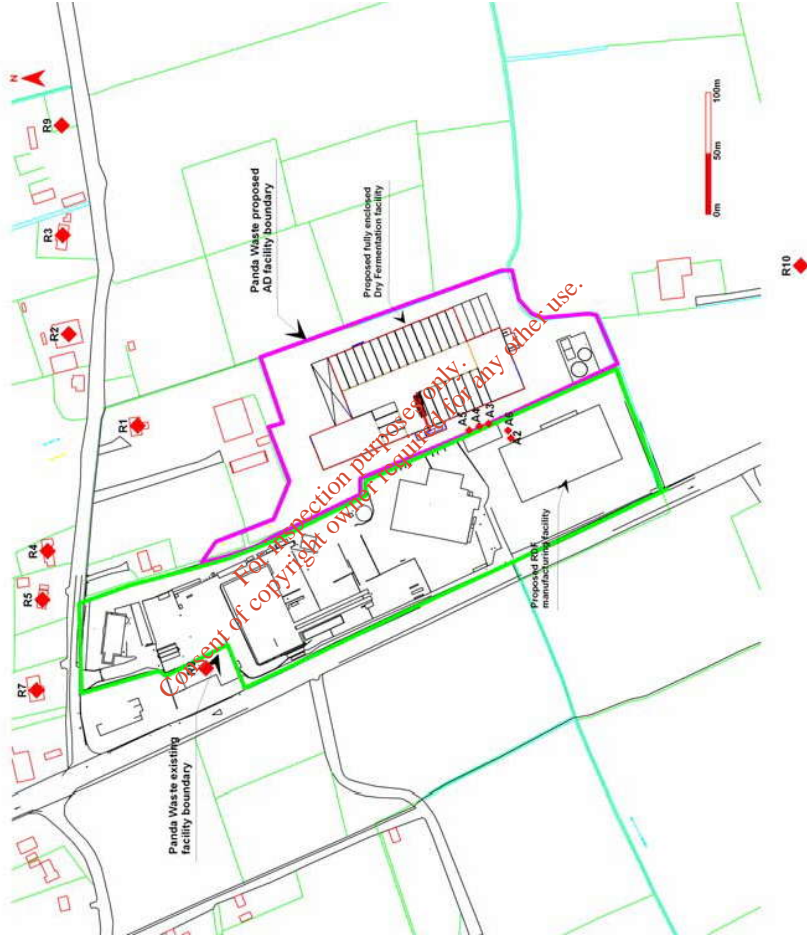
Plan view facility layout drawings for Panda Waste Ltd facility including specific location of proposed emission points A2 to A6 and nearest sensitive receptors R1 to R10.
